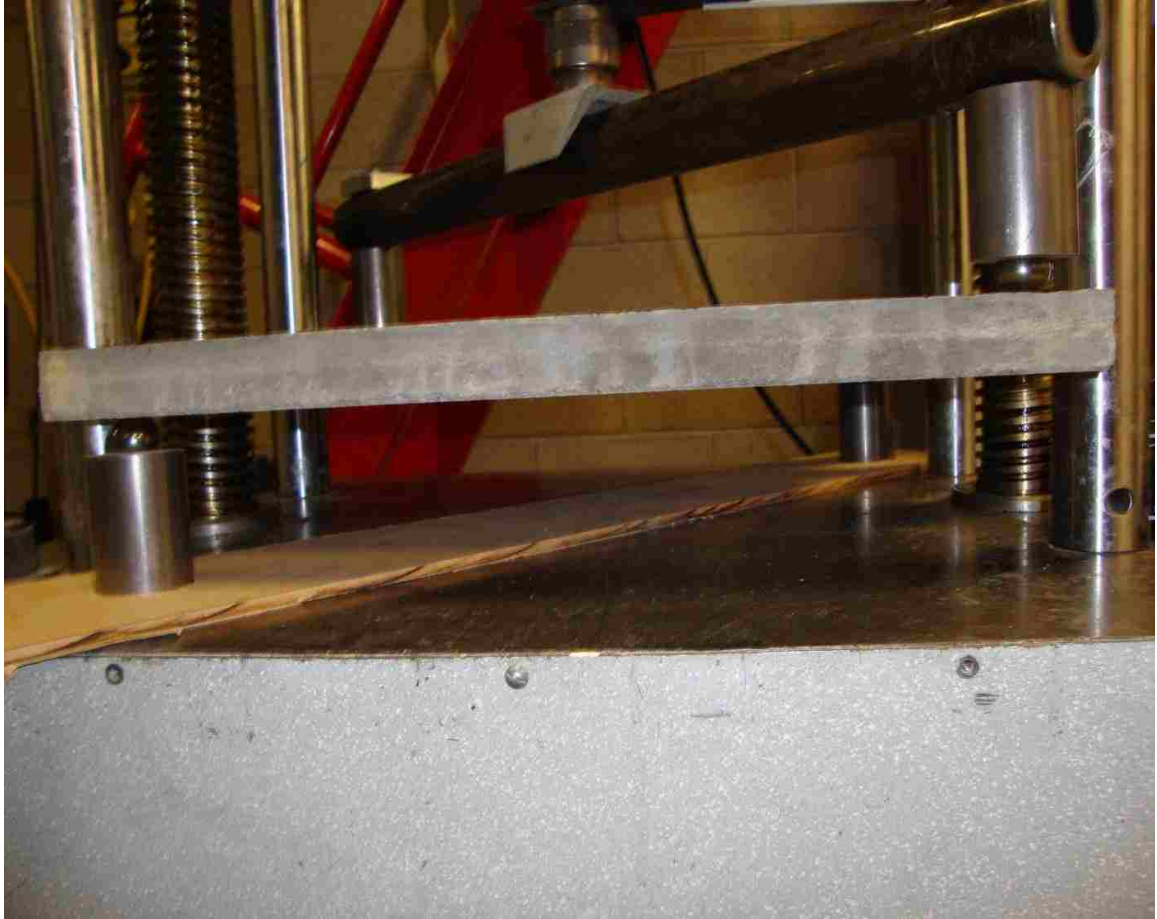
Test apparatus and specimen set up for opposite corner loads
